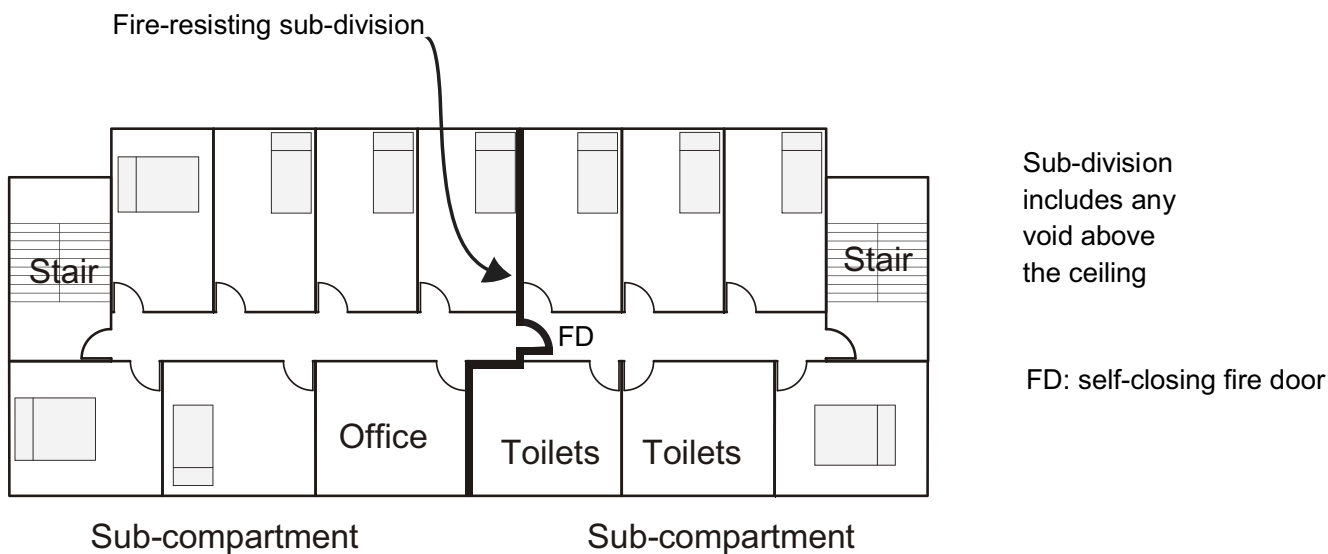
Plan Layout of an Upper Floor of a Care Home which is Sub-Divided into Two Sub-Compartments
